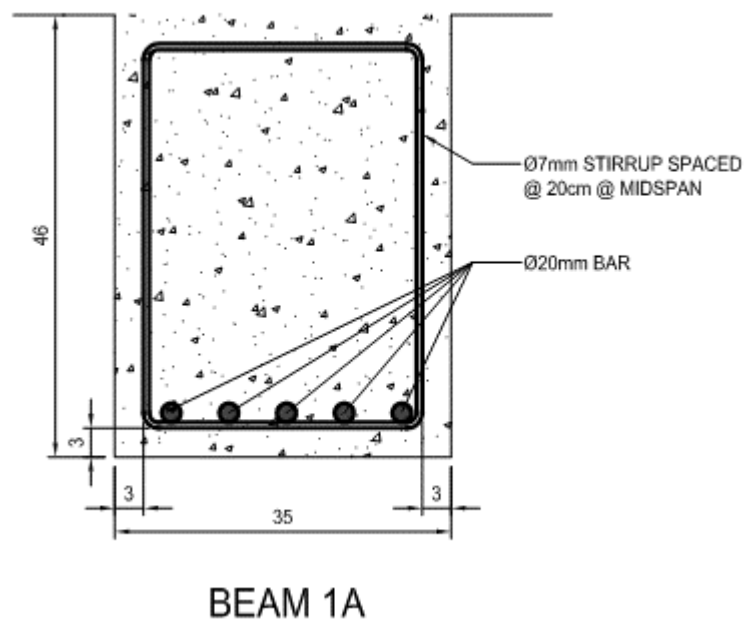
Beam 1A Cross Section with dimensions in centimeters [16]
